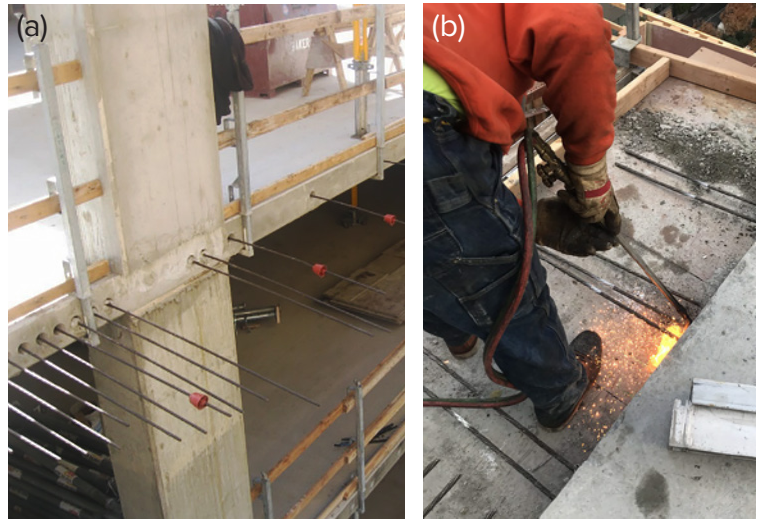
PT strand tails must be cut to allow protective systems to be installed at the anchors: (a) strand tails extending from a PT slab (image courtesy of PTI); and (b) a worker cuts a tail using an acetylene torch (image courtesy of Conco.)
